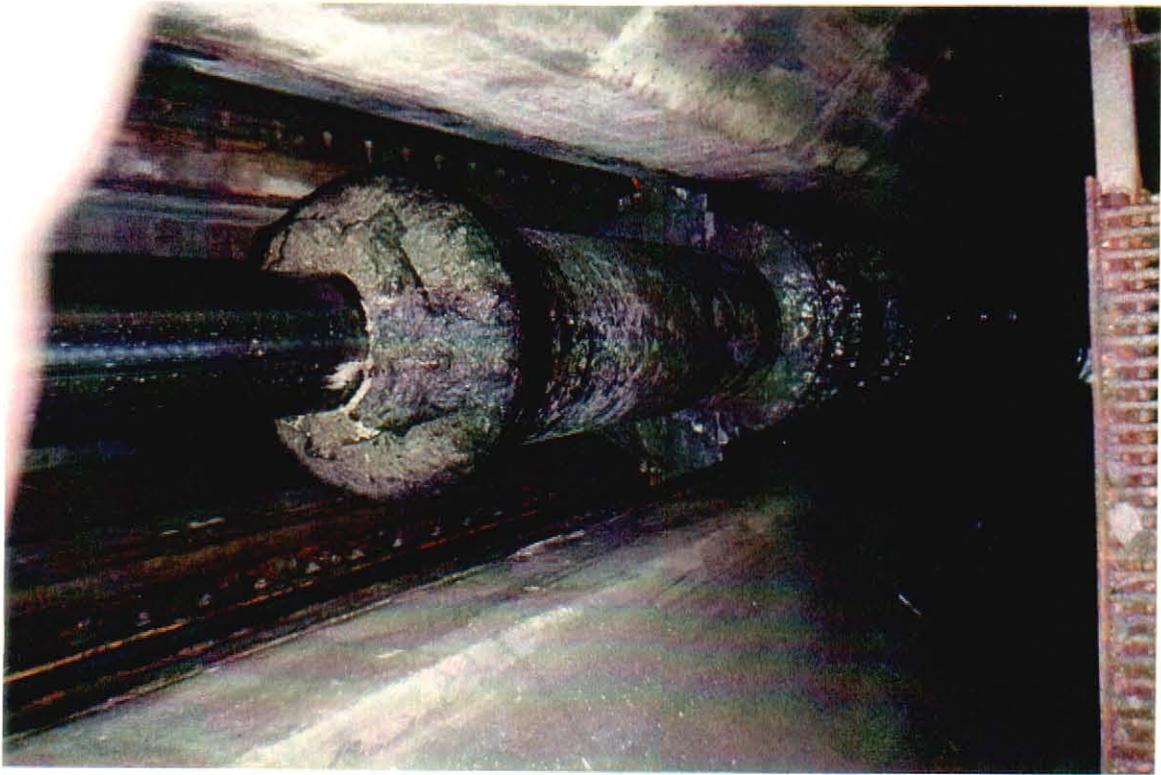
Hydraulic Piping Inside East Abutment Cylinder Well
